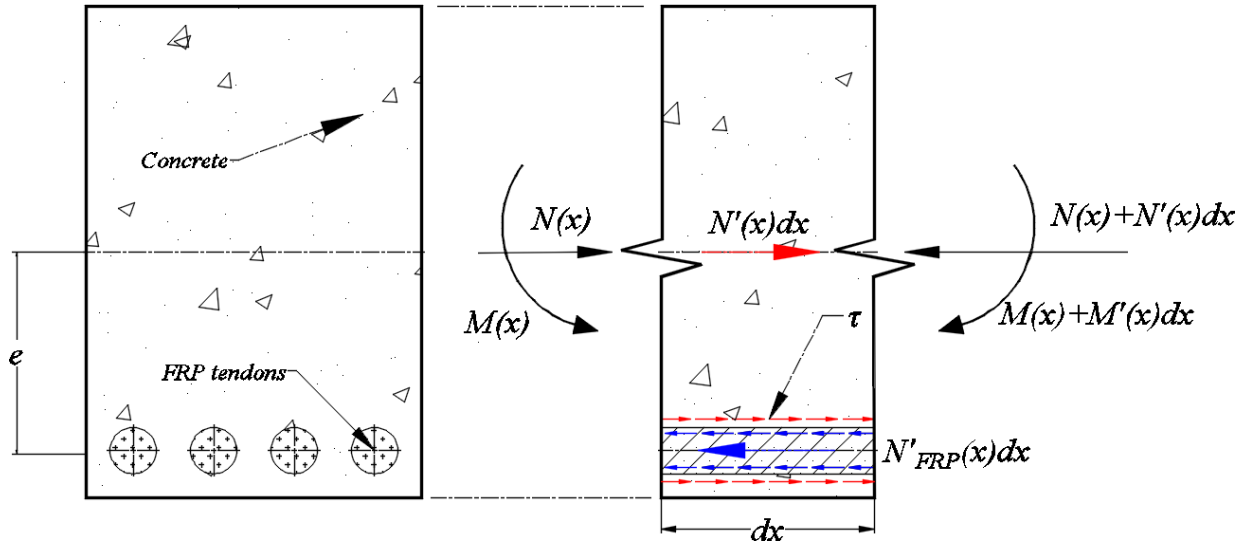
Cross-section of prestressed FRP reinforced concrete member under internal forces
